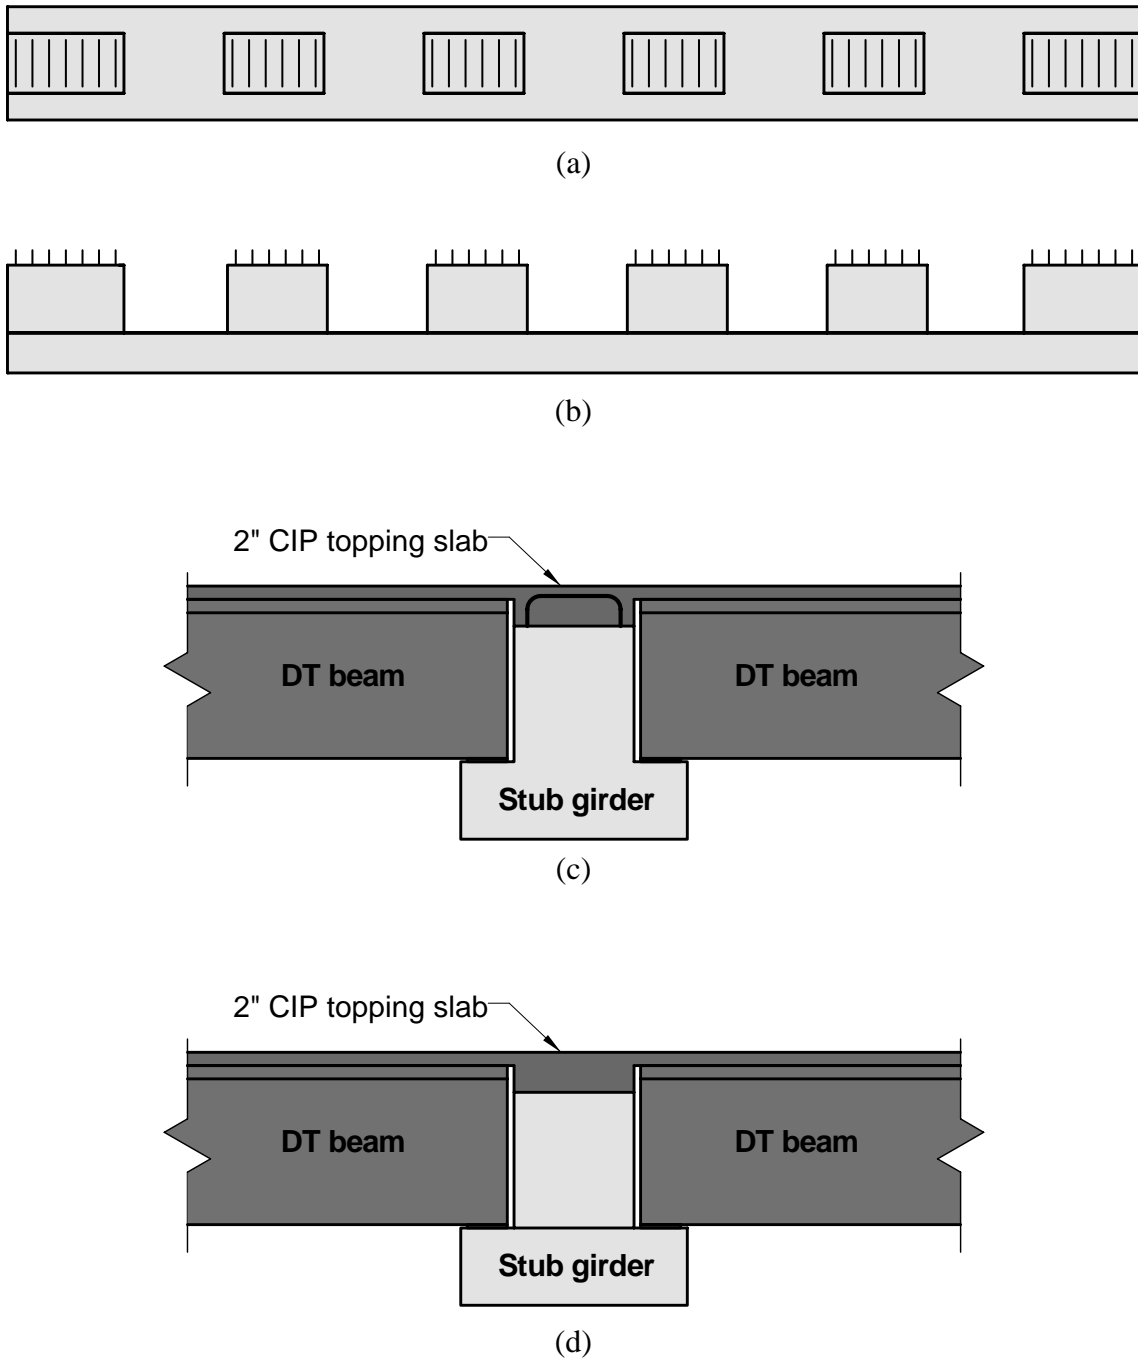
Prestressed concrete stub girder (adapted from Pessiki et al., 1997): (a) plan; (b) elevation; (c) section through a stub, including DT beams and topping; (d) section through an opening, including DT beams and topping
